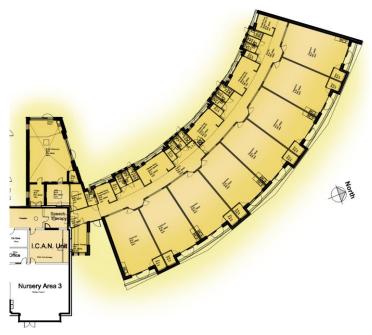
Plan of Junior Block (extension C). The room layout of main building (extension B) is shown as it was prior to the addition of the Junior Block. Note that the 'Speech therapy' room has been relocated.
